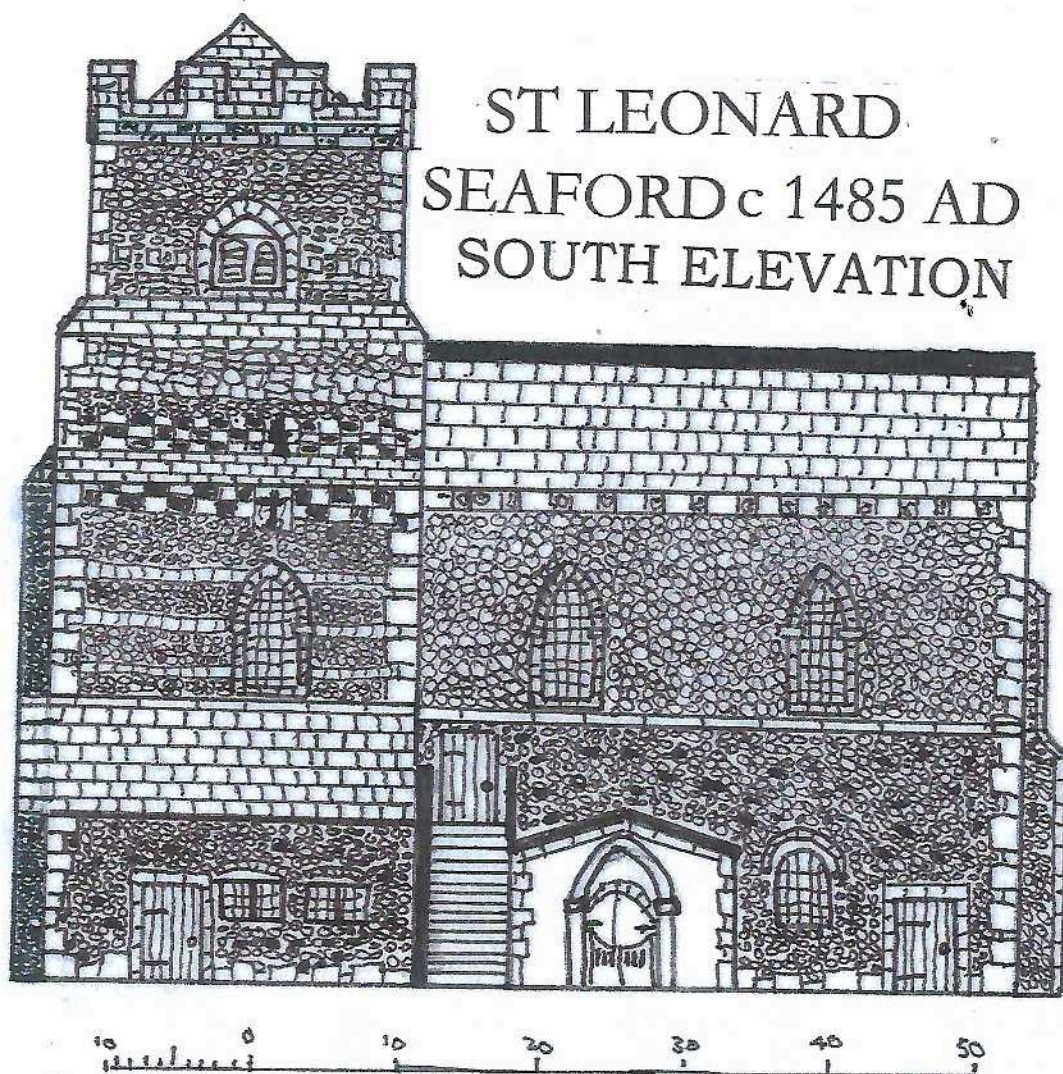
c C1485 The south elevation with new tower and no separate chancel
